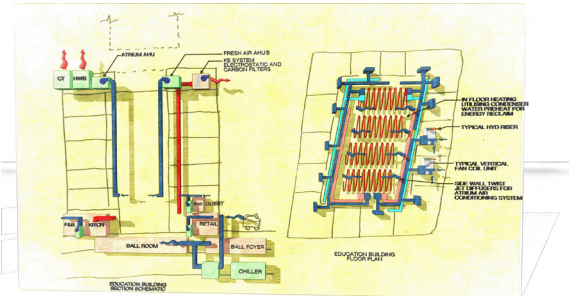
Services block planning- Education Building section schematic & floor plan
